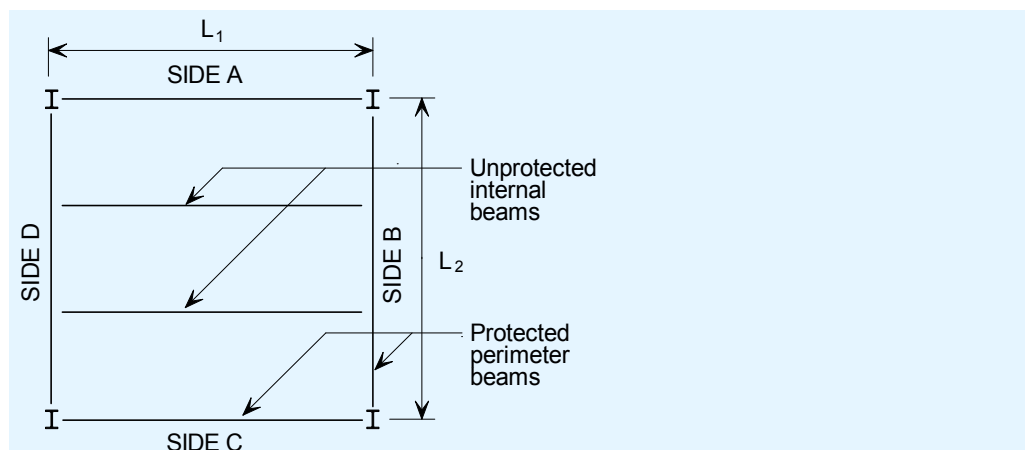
Definition of span 1 (L_1) and span 2 (L_2) and the beam layout for a floor design zone in a building requiring fire resistance of 60 minutes or more.
